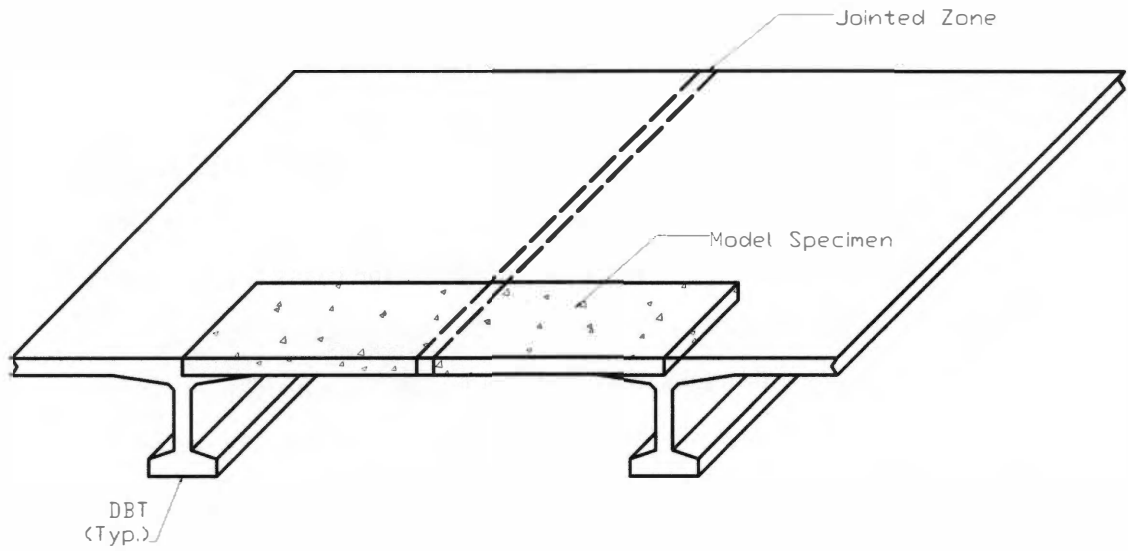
Model Specimen in Relation to the Long Span Deck and DBT System
